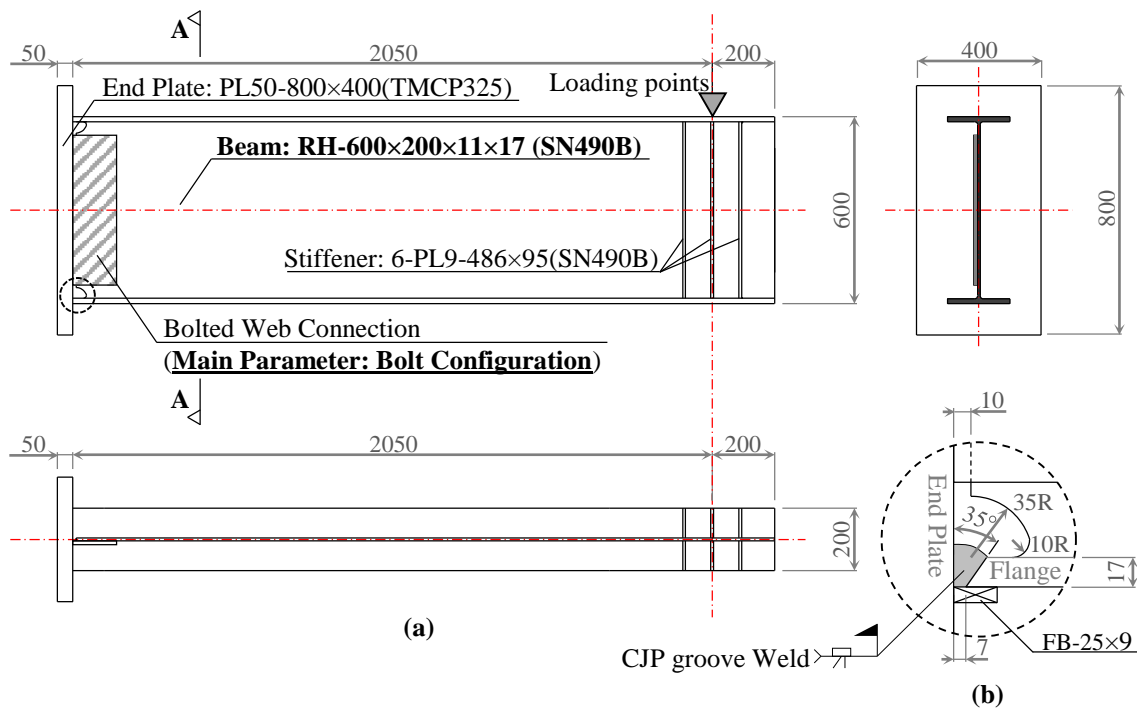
WFBW Beam-End Connection: (a) specimen and (b) details of beam-flange groove welds
